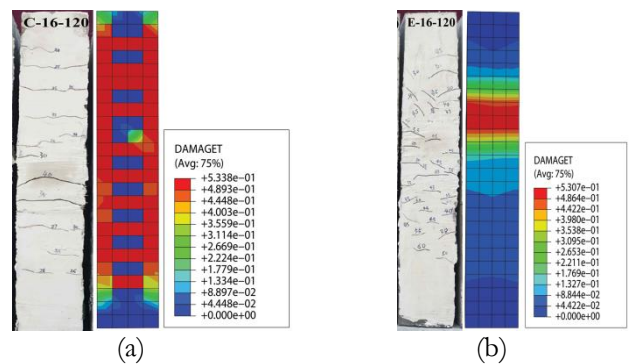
Crack pattern and damage quantification at tensile for: (a) C column; (b) E column.
